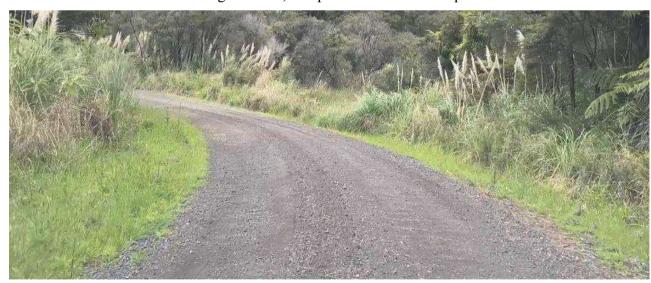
Looking northeast along Te Raupo Road from 1230 metres and another existing passing bay.
